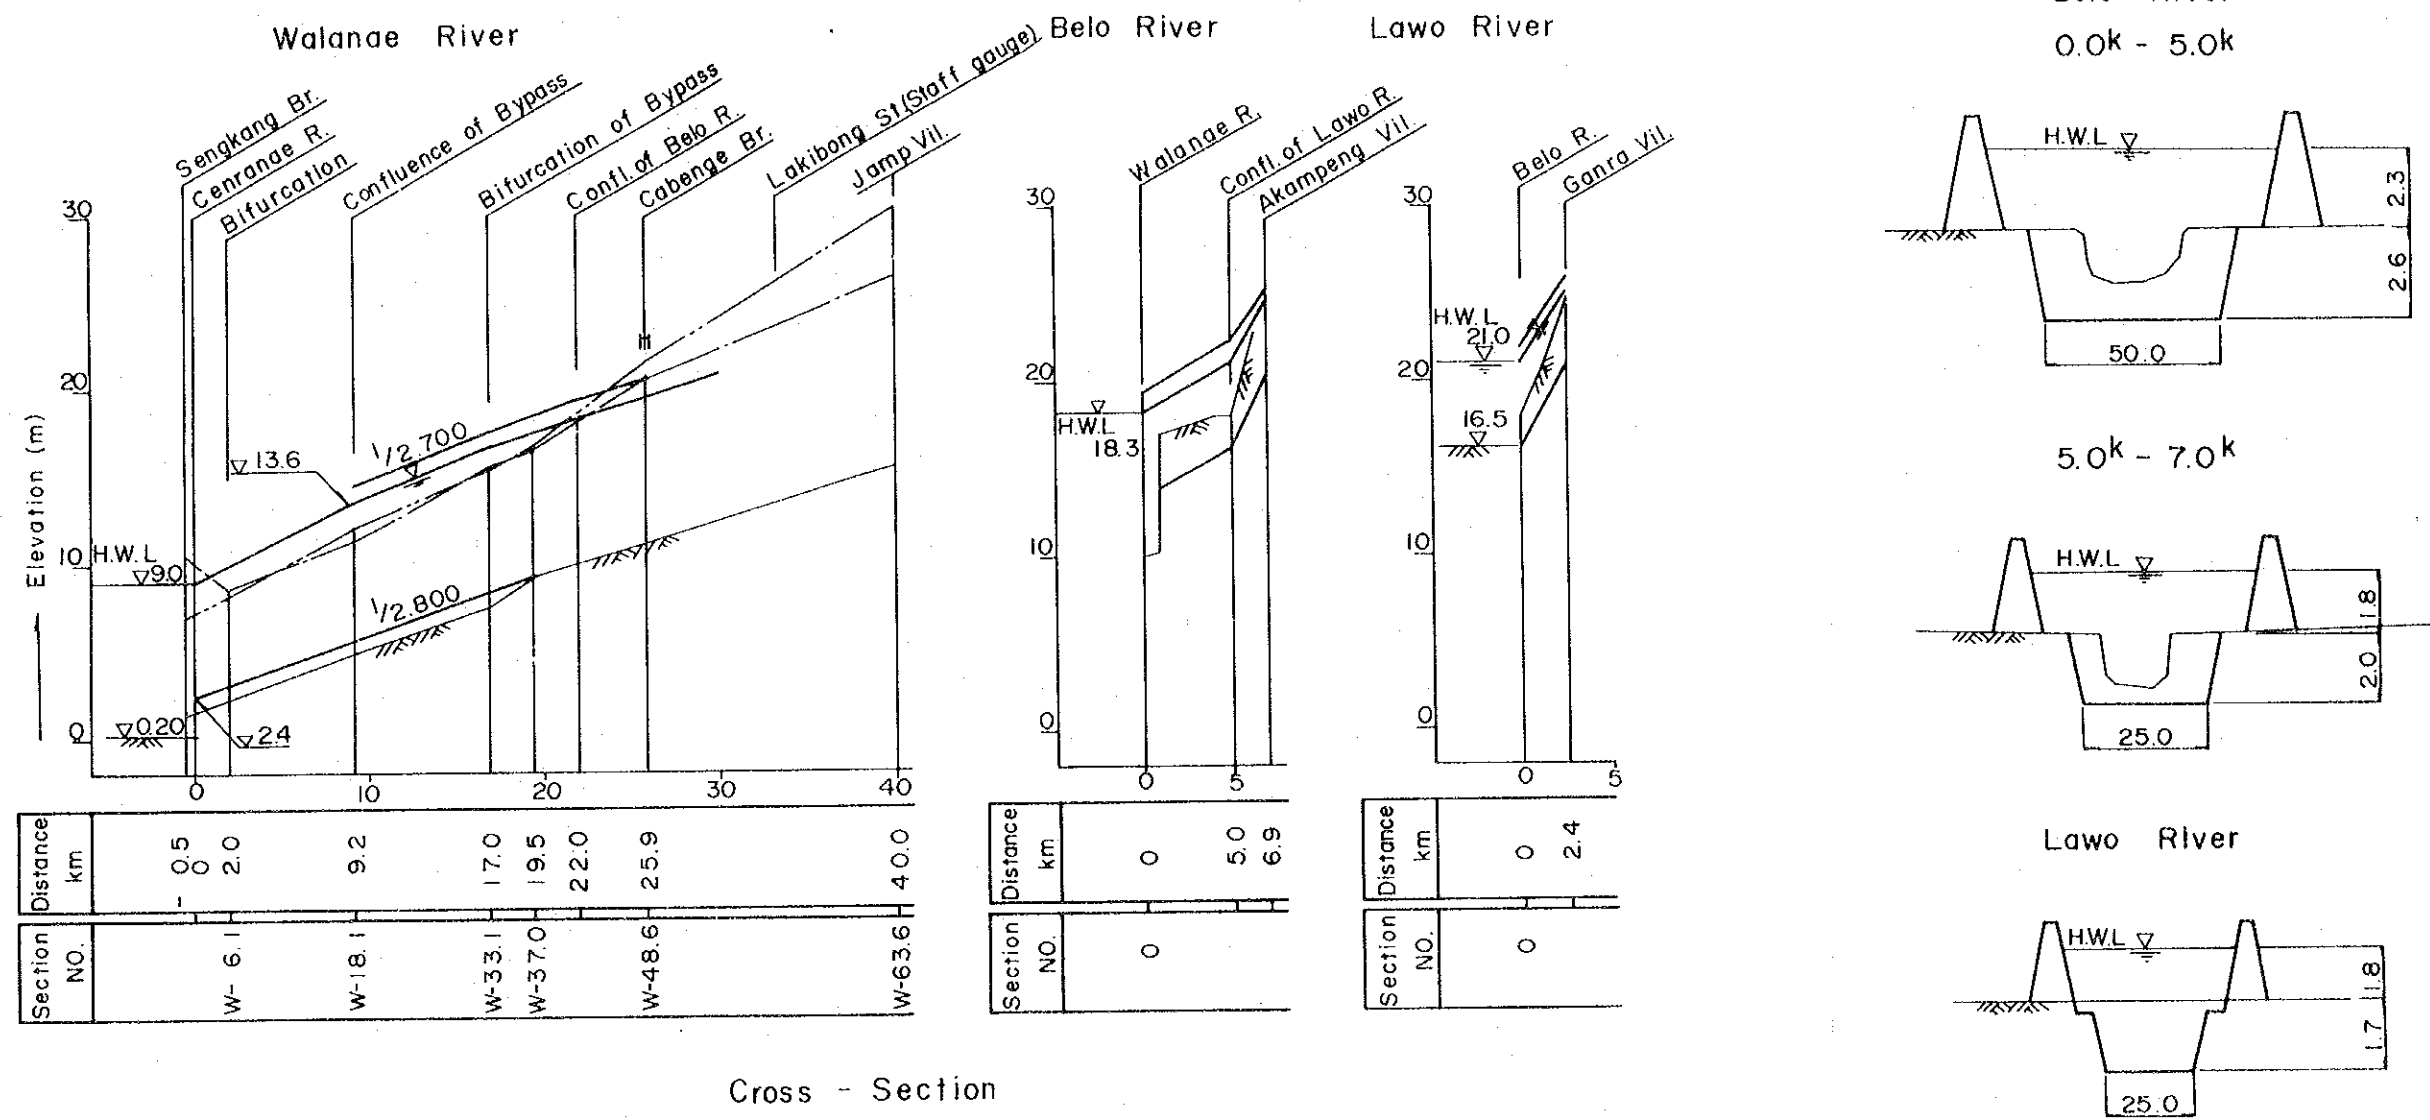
Planned Longitudinal Profiles and Cross-Sections of Walanae River
